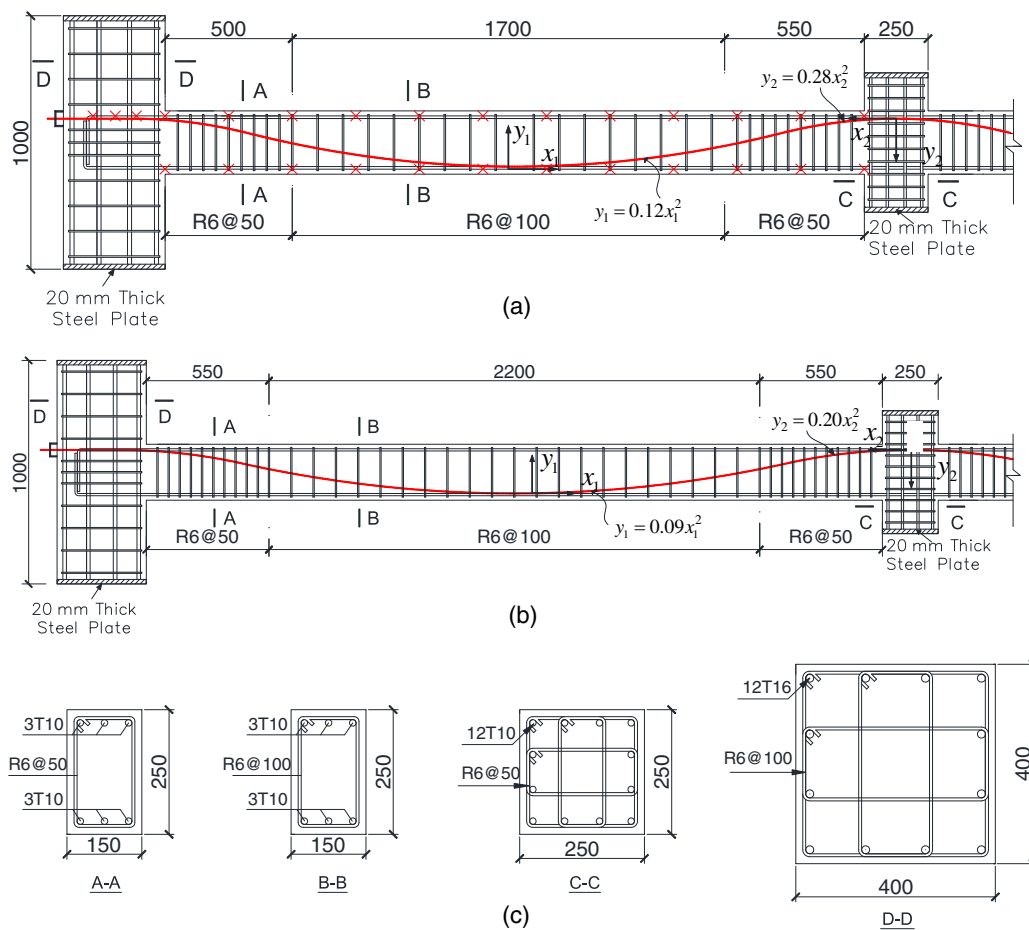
Dimensions and reinforcement details of typical prestressed specimens: (a) PCS-0.4; (b) PCL-0.4; (c) cross sections
